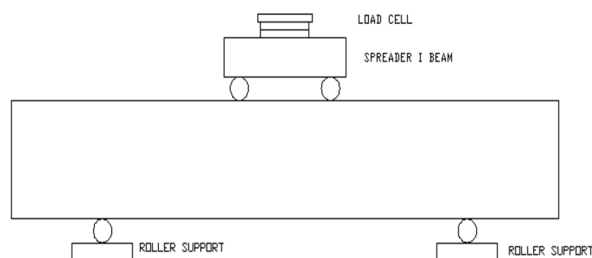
Geometry of beam specimen (All dimensions are in mm)
